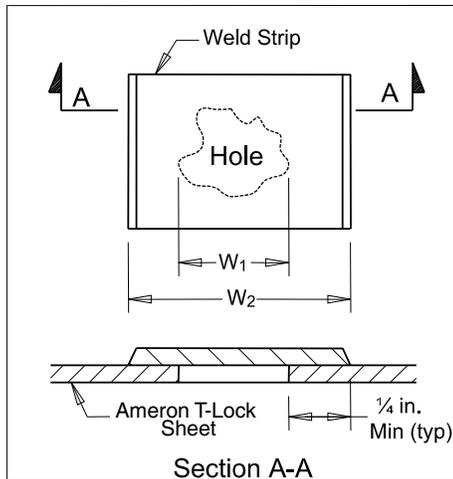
Small holes or cuts in the Ameron T-Lock liner can normally be patched by welding a piece of flat weld strip over the hole or cut.
